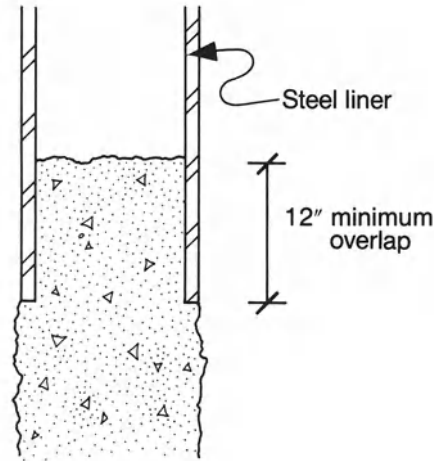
Removal procedure of steel liner in caisson work to prevent spillage of earth into an unguarded excavation.
